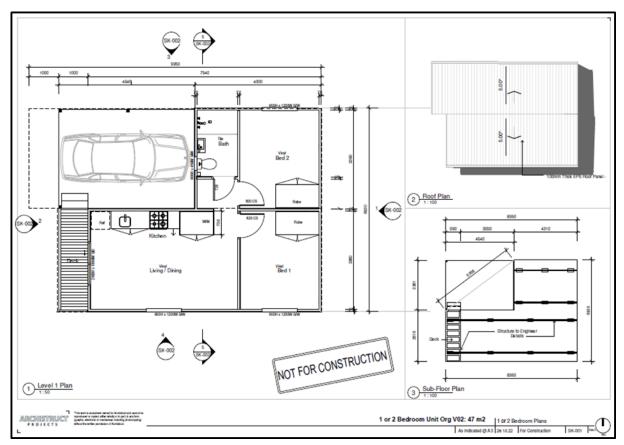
Proposed Unit Floor Plan. Source: Applicants submission
